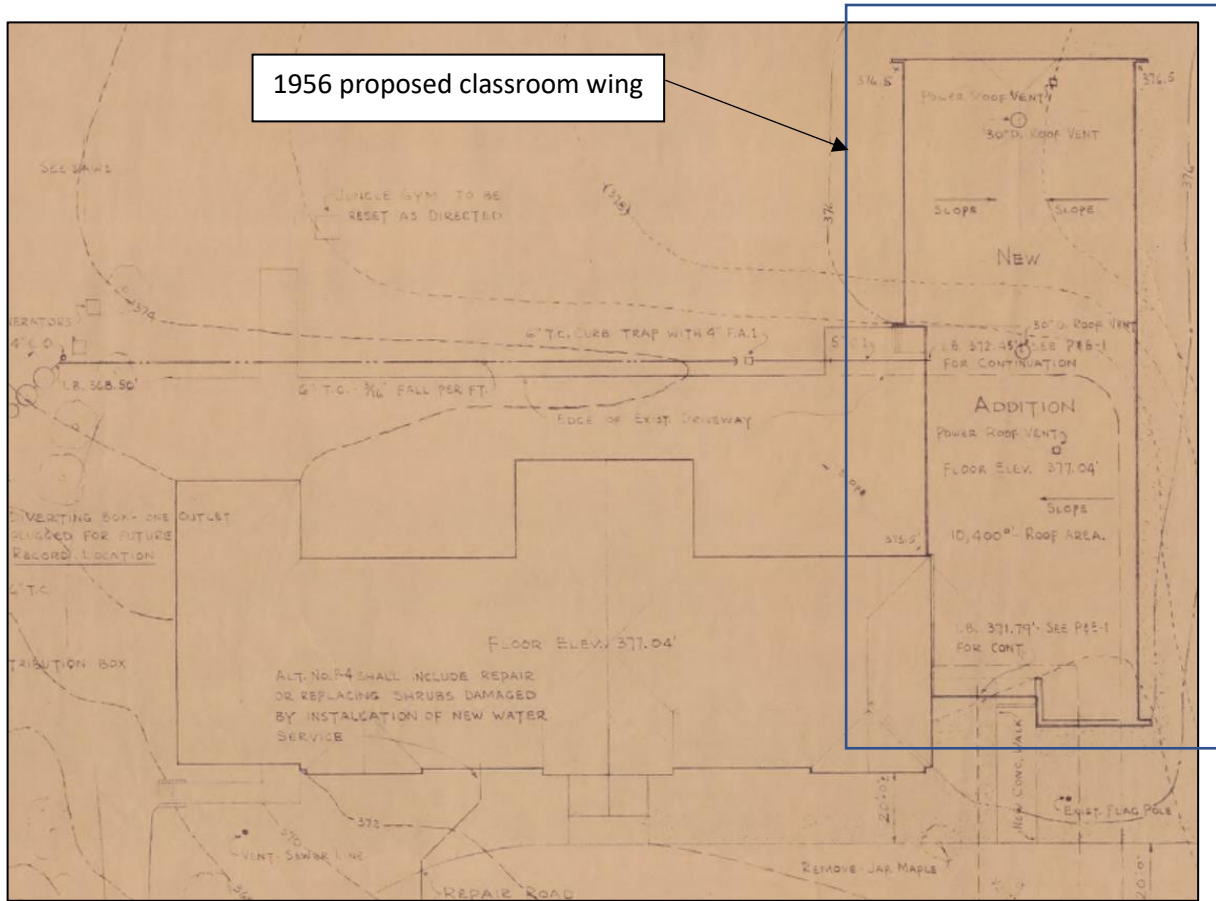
Architectural drawings of Fridtjof Tobiessen office, plot plan, additions to the East Whiteland Elementary School (as stated on the drawings), 1955. (provided by Great Valley School District)
